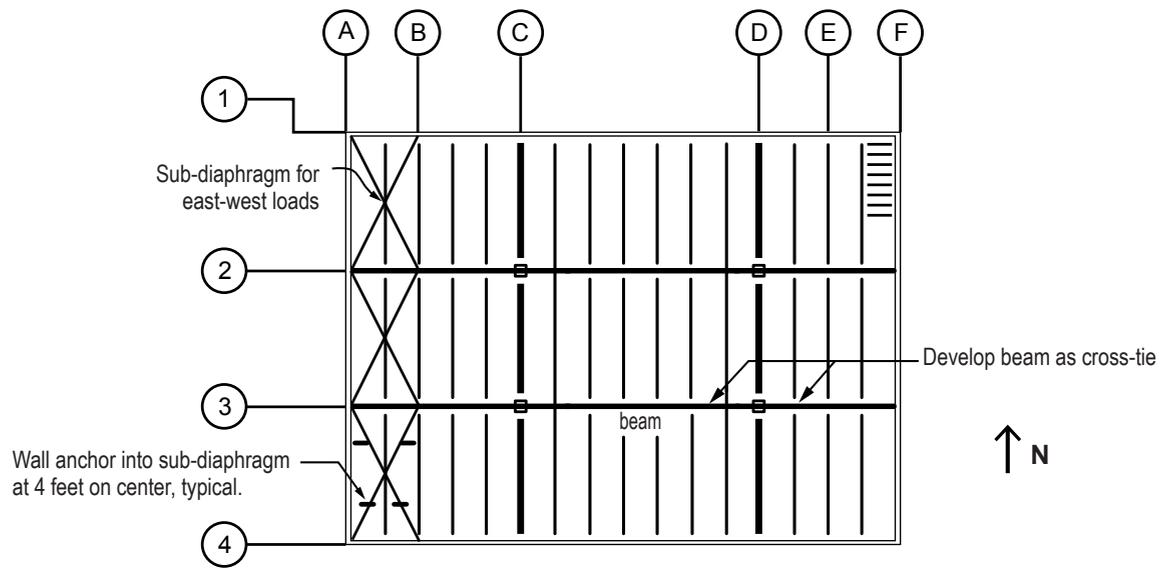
Plan of roof diaphragm with subdiaphragms for concrete or masonry wall seismic anchorage for loading in the east-west direction.
